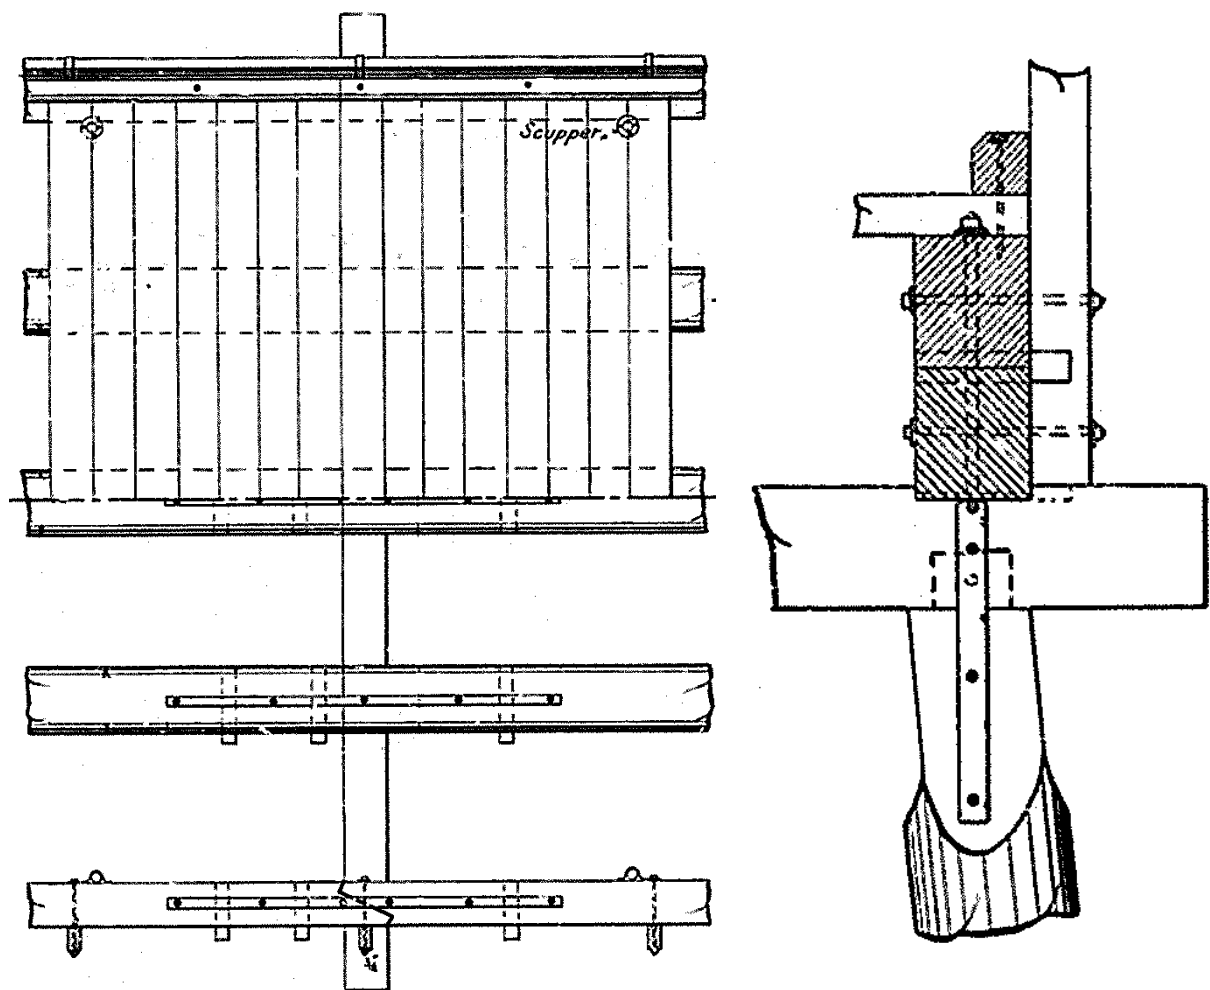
Pre-1893 Plain Beam Bridges: Corbel Plates & Scarf Joints (left) Mortise & Tenon Joint (right)
